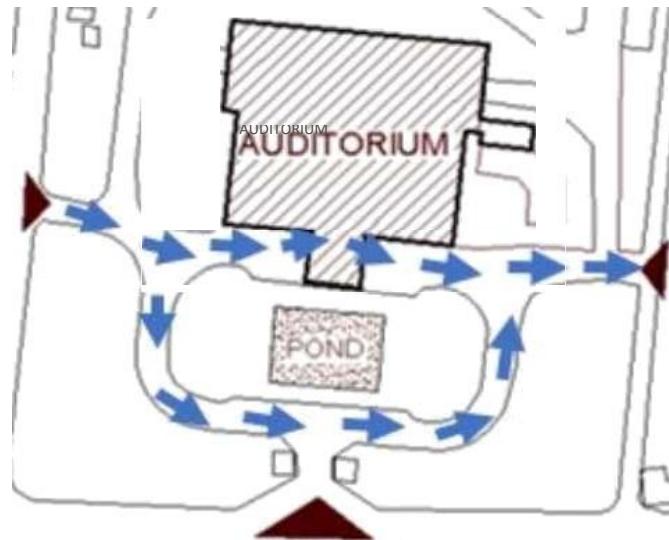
Illustrative site plan of Nepal Academy Hall
